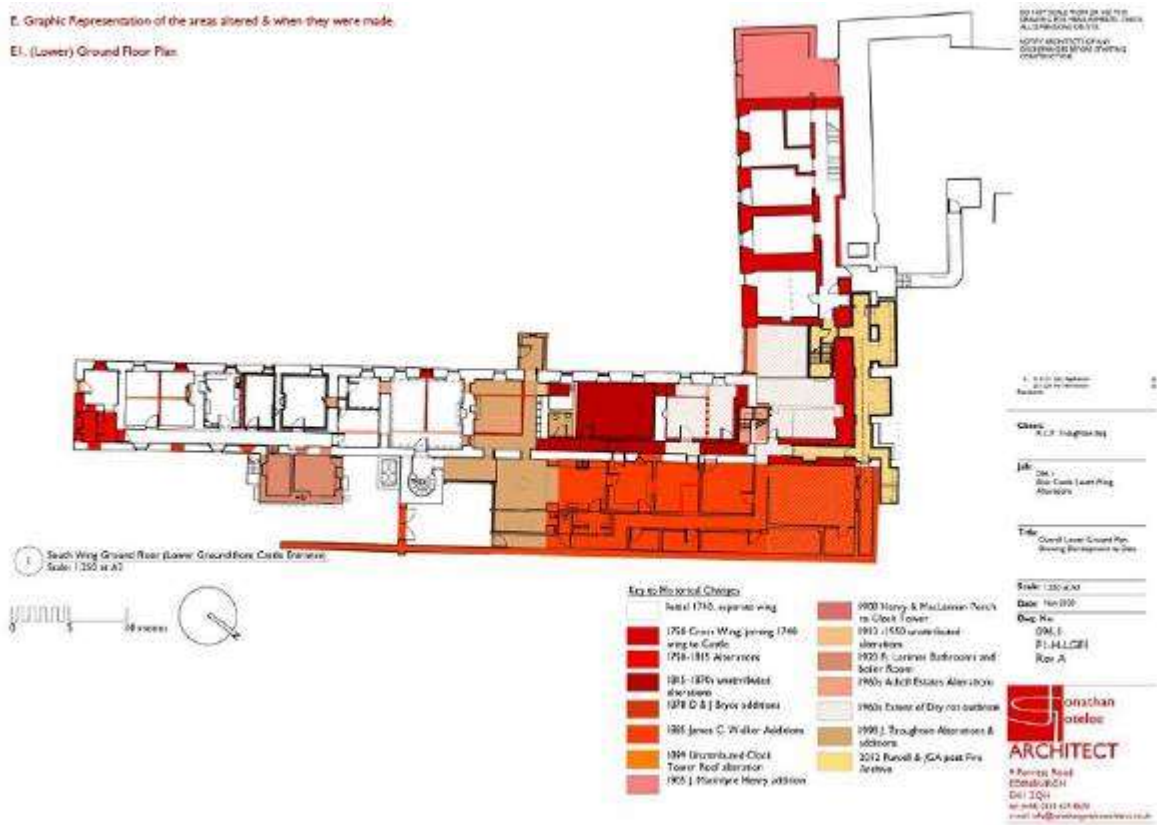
Representation of the areas altered & when they were made. (Lower) Ground Floor Plan.
